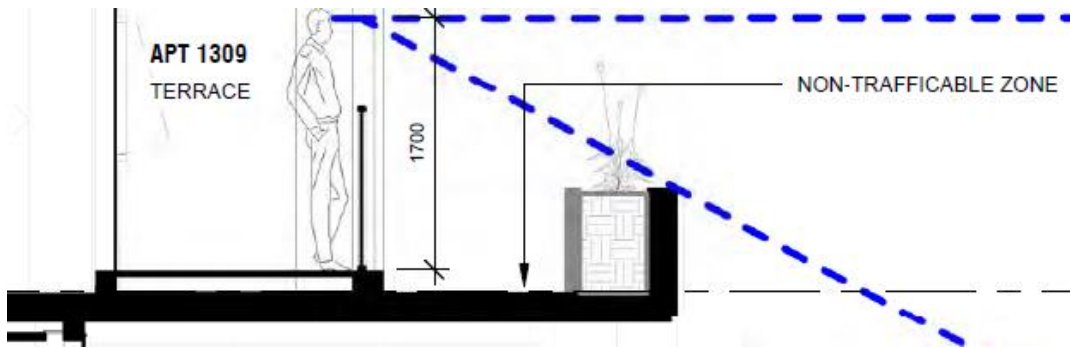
Section showing private terrace and common property planter and non-trafficable zone
